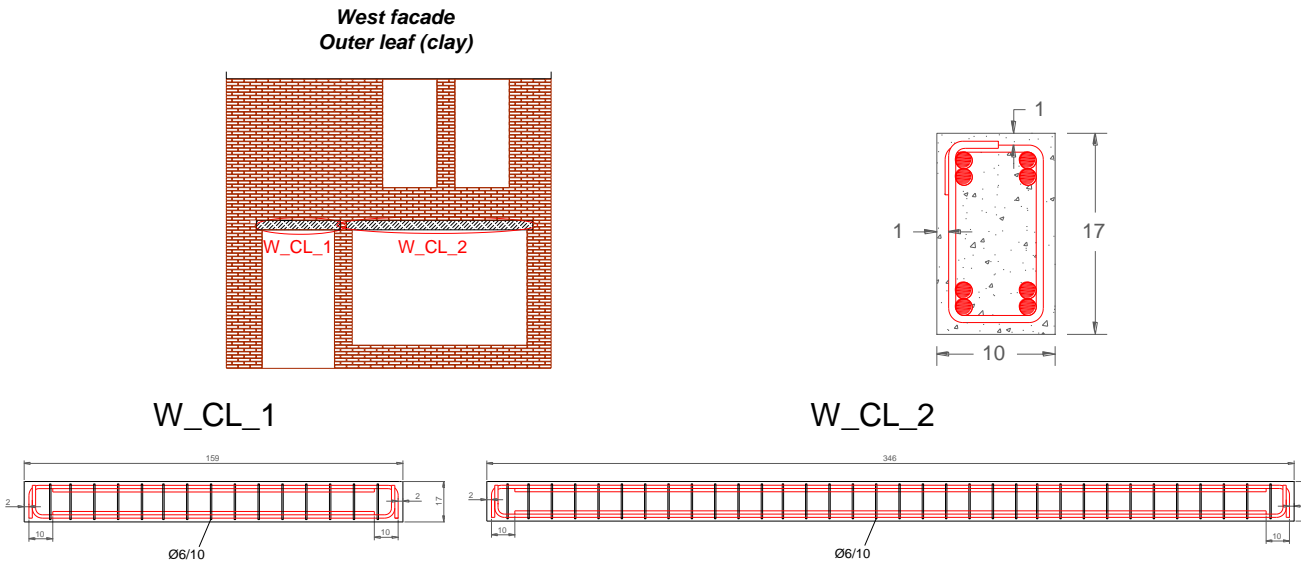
Reinforced concrete lintel details: West facade outer leaf. Units of cm.
